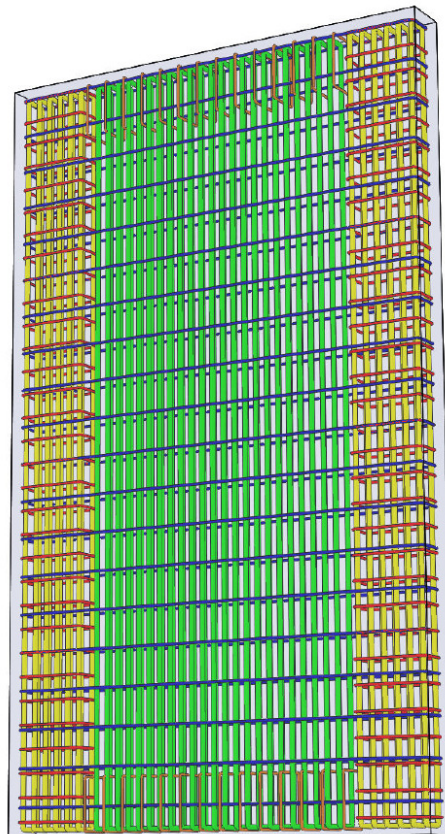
WALL WITH REINFORCEMENT AND HEADED STUD CONNECTORS
